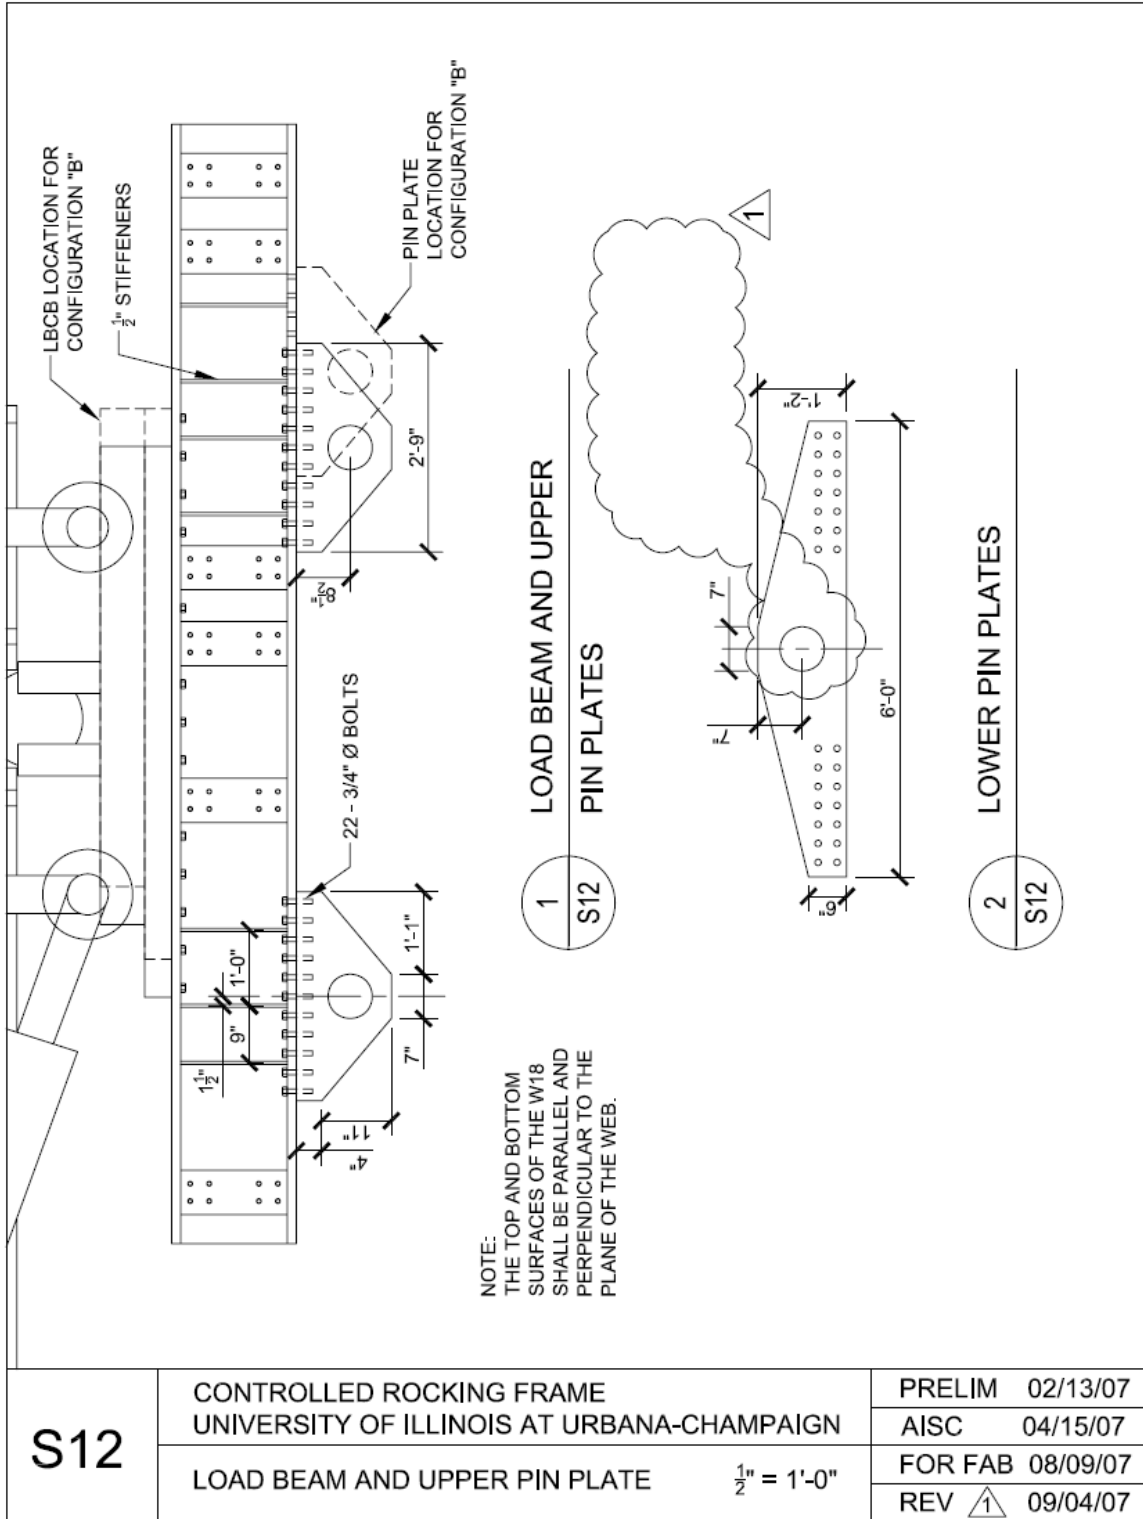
Specimen Design Drawing – Load Beam and Upper Pin Plate
